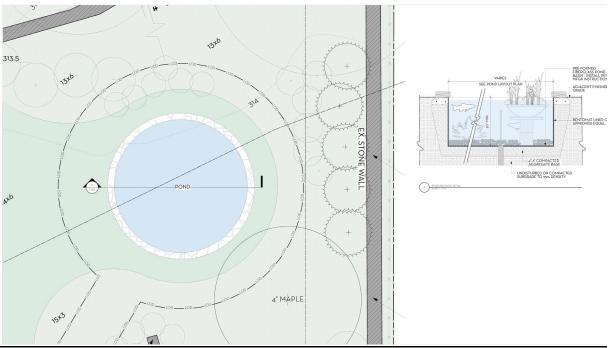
The plan for the pond. It will be at least 20 inches deep.
